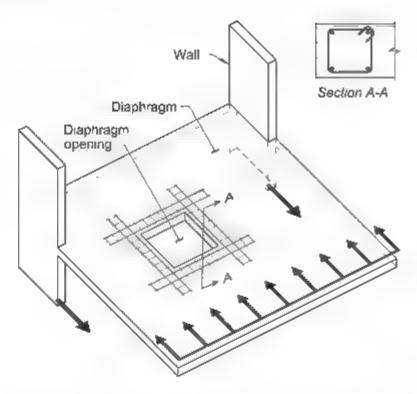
6a—Reinforcement detail around opening within diaphragm
